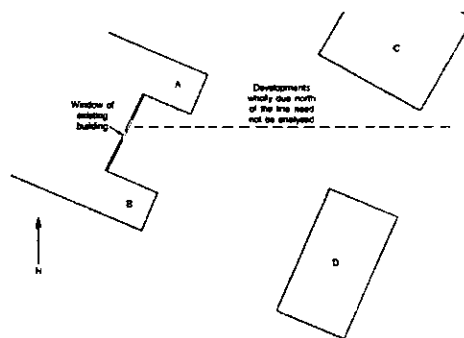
In analysing the sunlighting impact on the existing window, no check need be made for proposed extension A and new building C, as they lie within 90° of due north of the window. Proposed extension B should be checked, as should new building D if it subtends more than 25° to the horizontal, measured in section from the centre of the window
